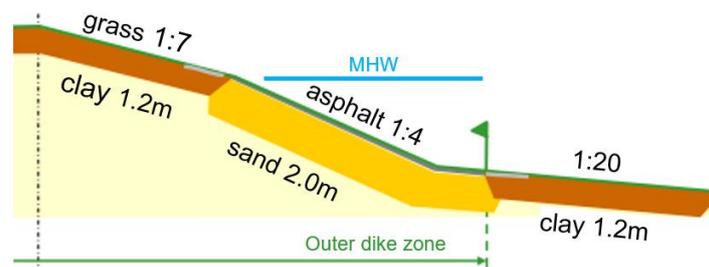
Current (traditional) dike design (adapted from van Loon-Steensma & Schelfhout (2013))
